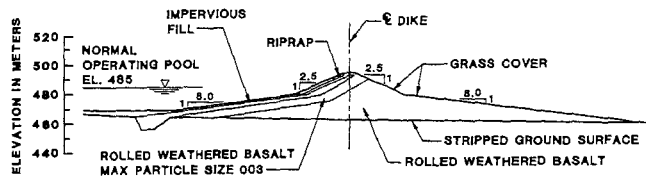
RIO LINDO HYDROELECTRIC PROJECT, HONDURAS TYPICAL DIKE SECTION
